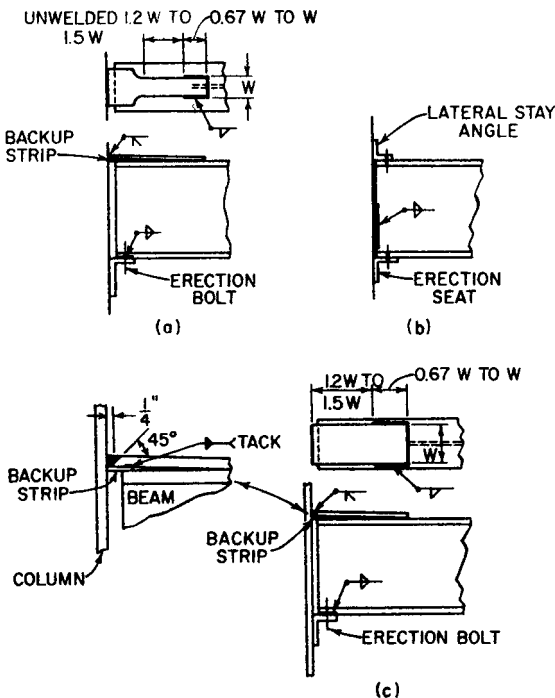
Methods of constructing flexible welded connections.
